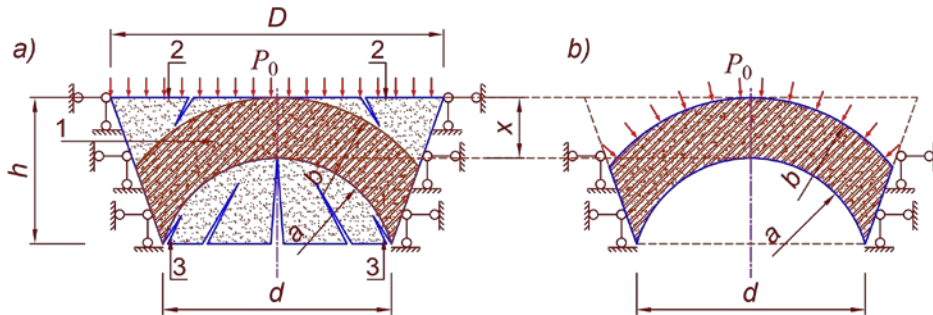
Calculation model for concrete end element with load bearing wall having high stiffness:
